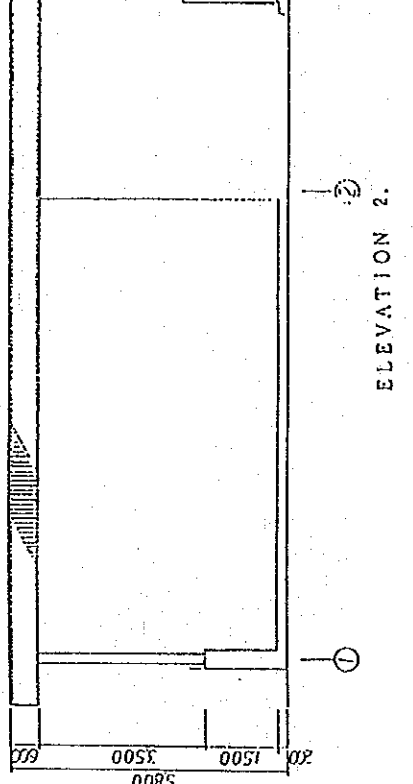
Floor Plan of Warehouse, Workshop and Elevations
